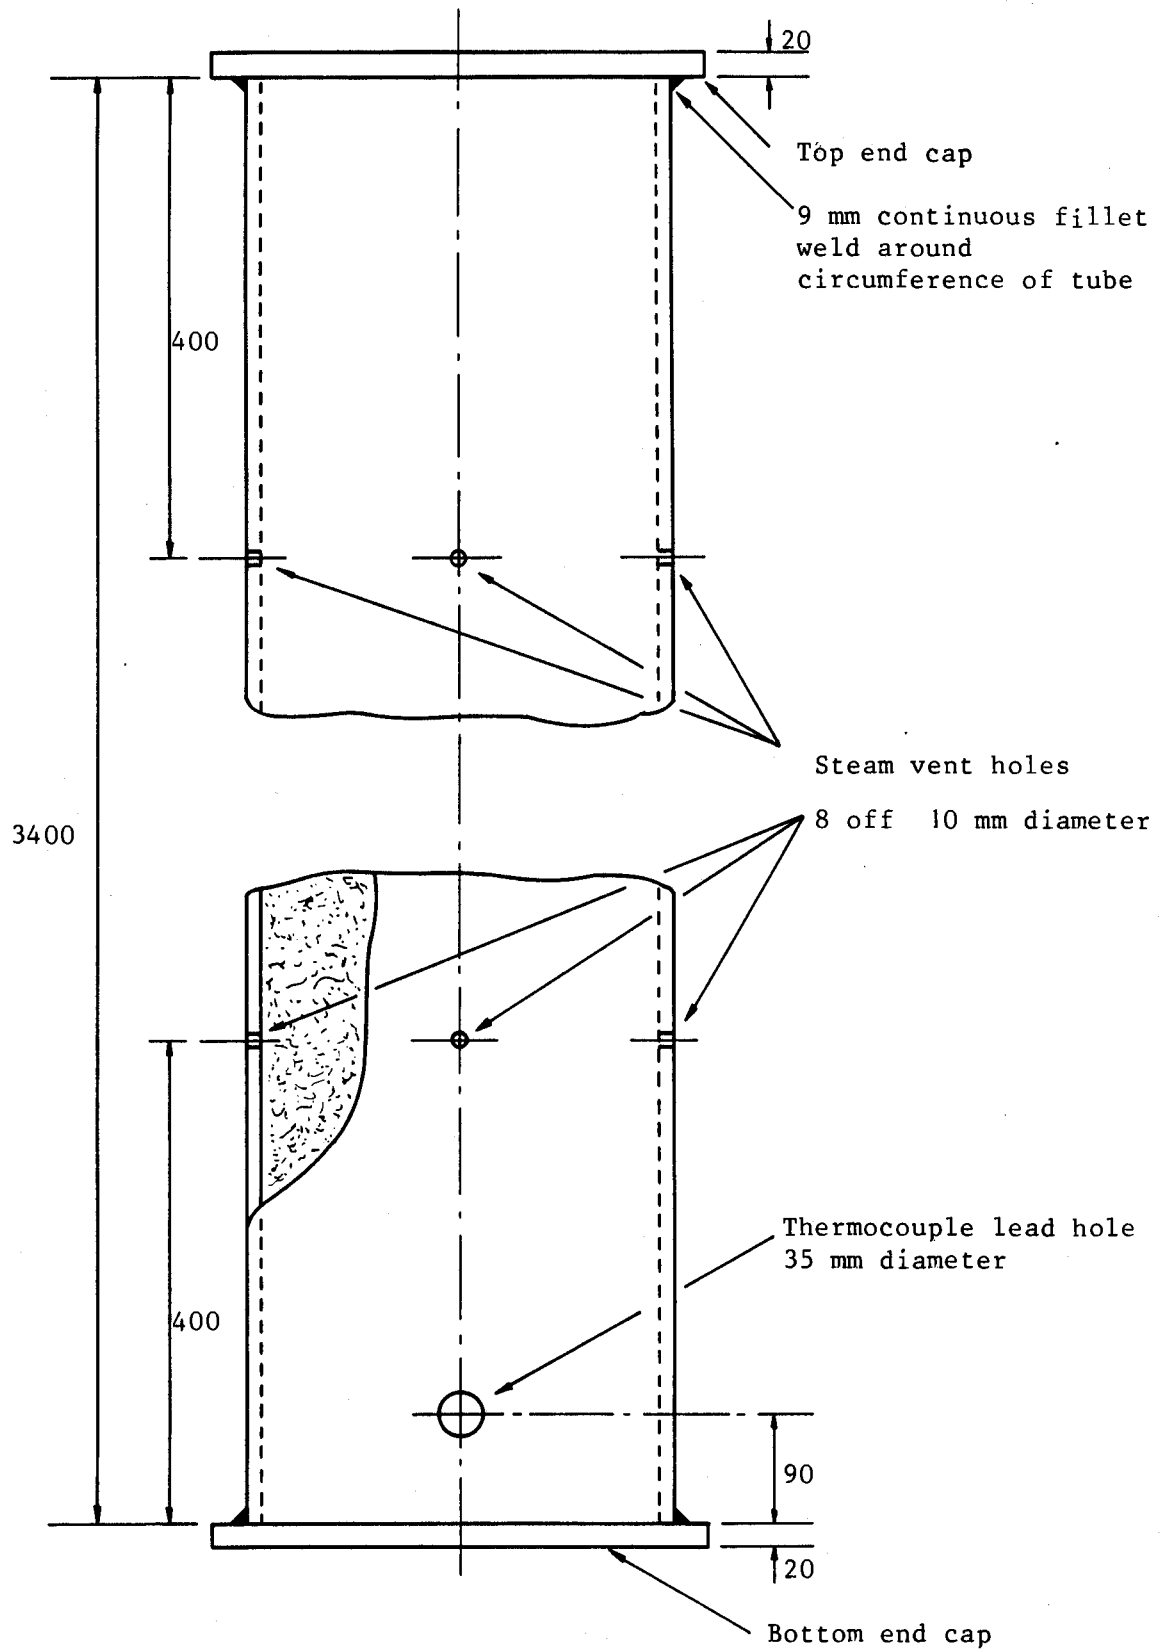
FABRICATION DETAILS FOR COMPLETED TEST SPECIMENS (R3/9413)
